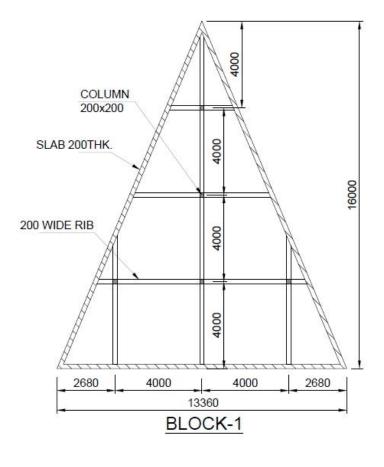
Plan view of concrete caisson with 200 m wall thickness. The caisson is to be constructed in multiple units.
